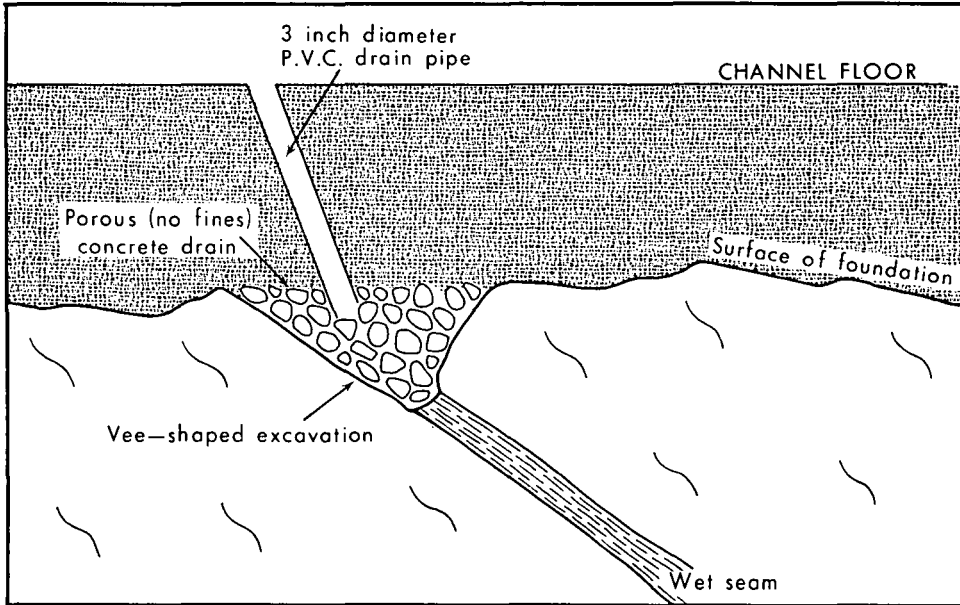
Diagrammatic section through typical "wet seam drain" in floor of spillway channel.
